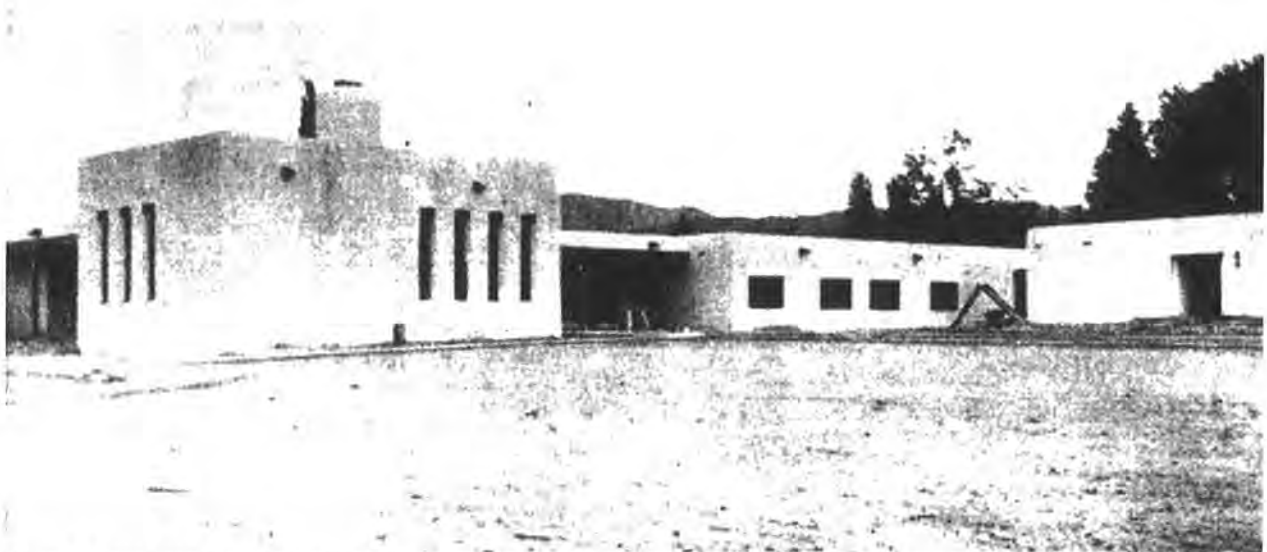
Casa Grande under construction, showing original south façade, May 1961. Courtesy *San Fe New Mexican*.
